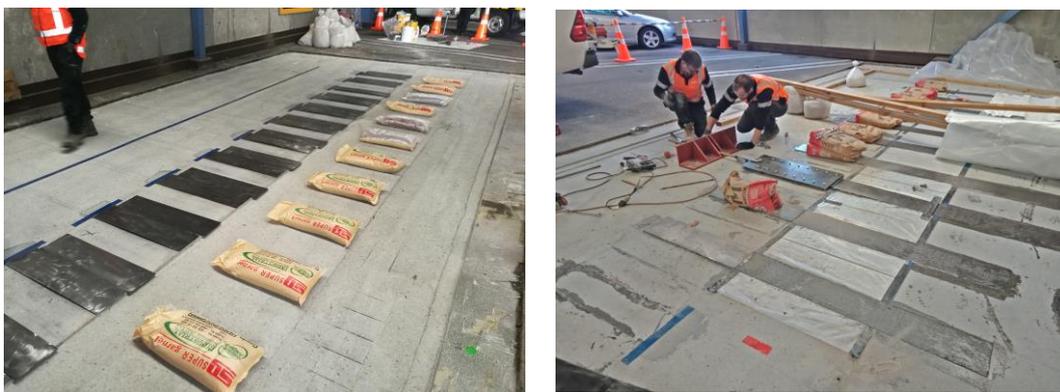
CFRP sheets and epoxy used in the tests (left). Pull-out test (right)
